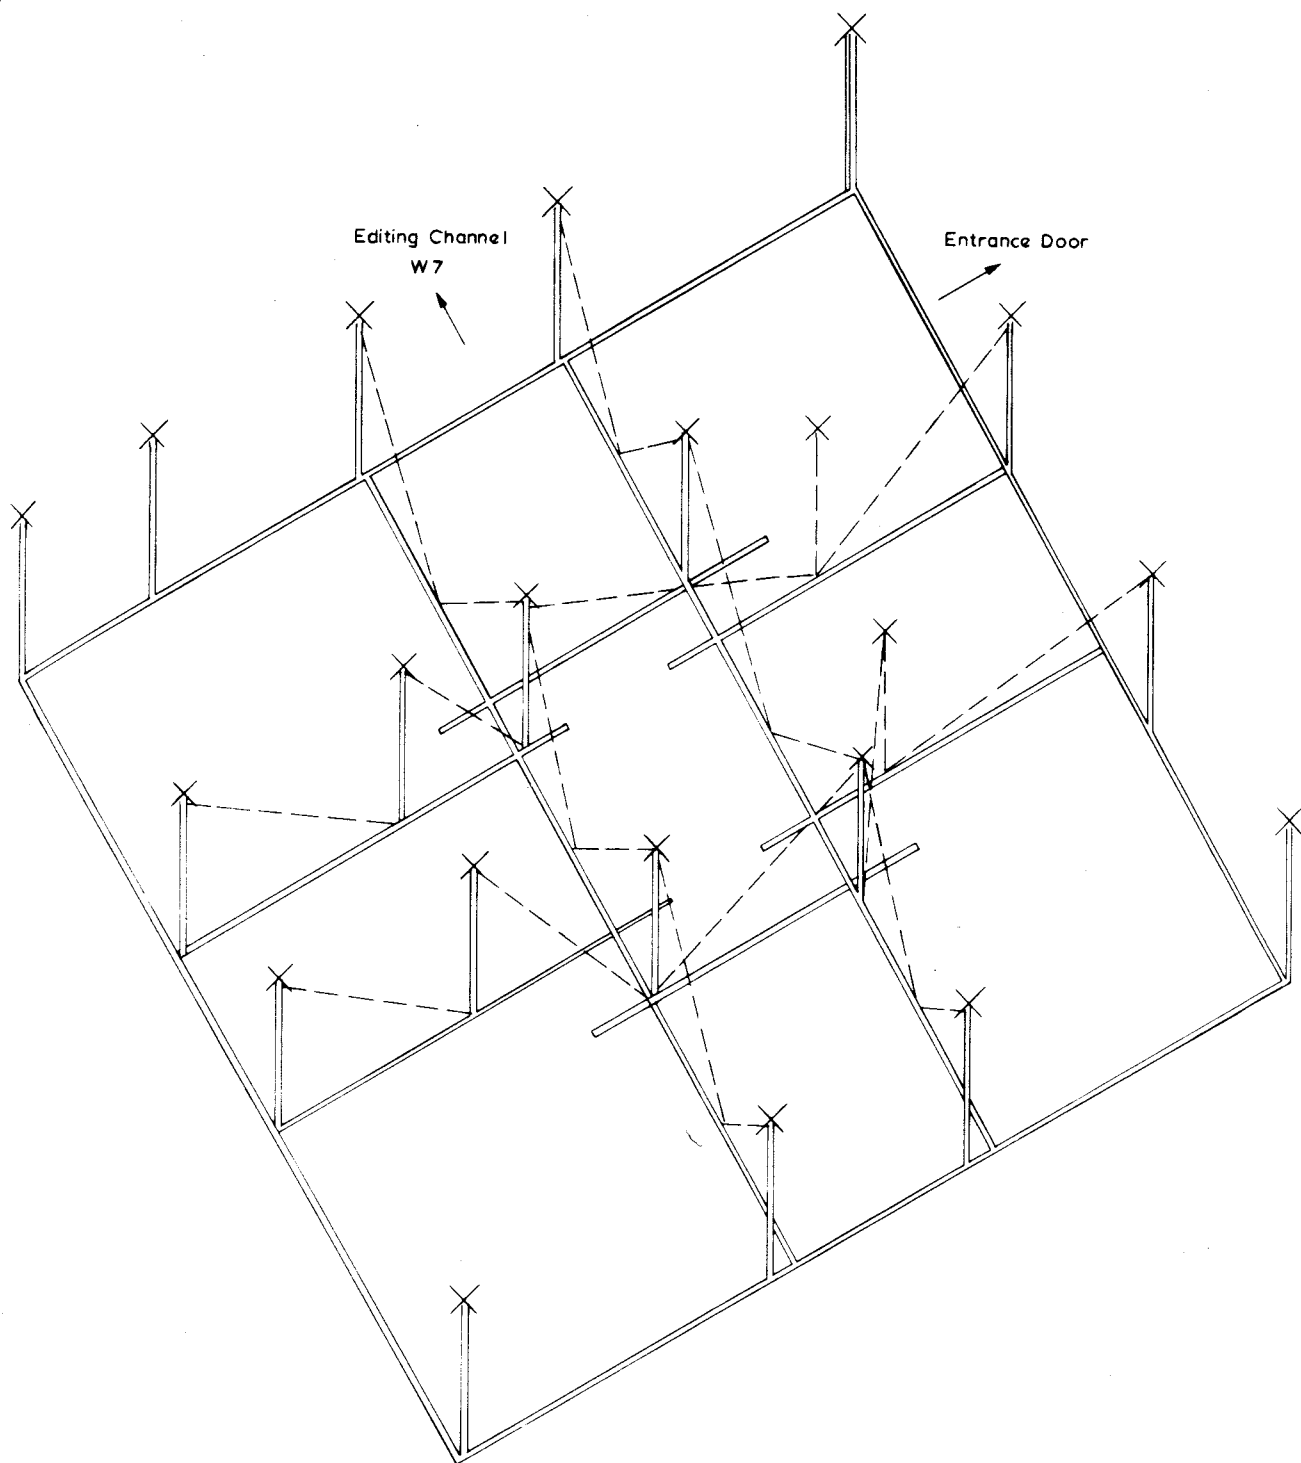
Axonometric projection from above showing ceiling plan of Studio 7.
